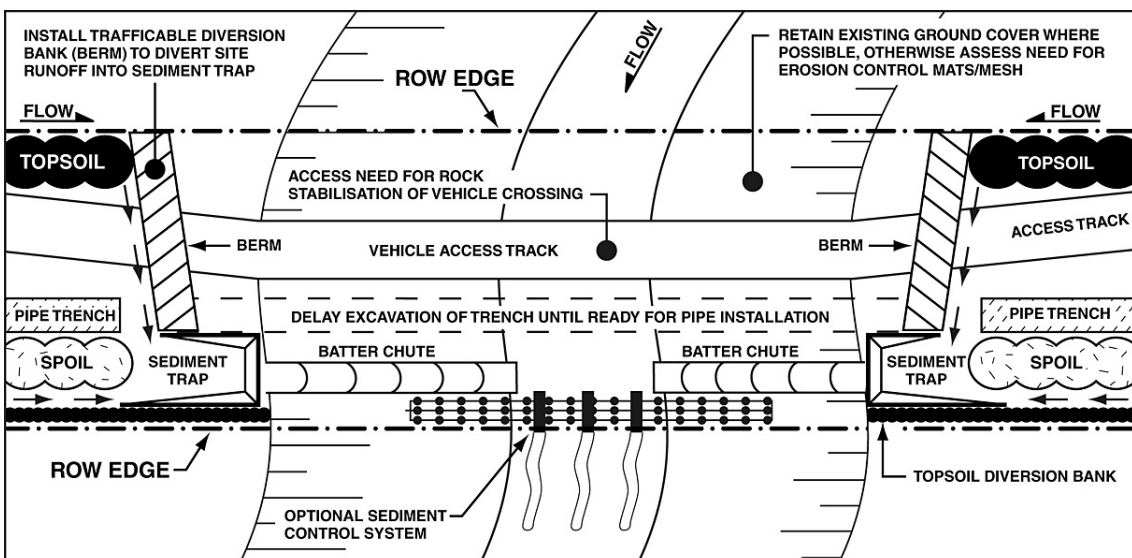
Alternative layout of pipe crossing of waterway with pipe trench located down-slope of the vehicle crossing
